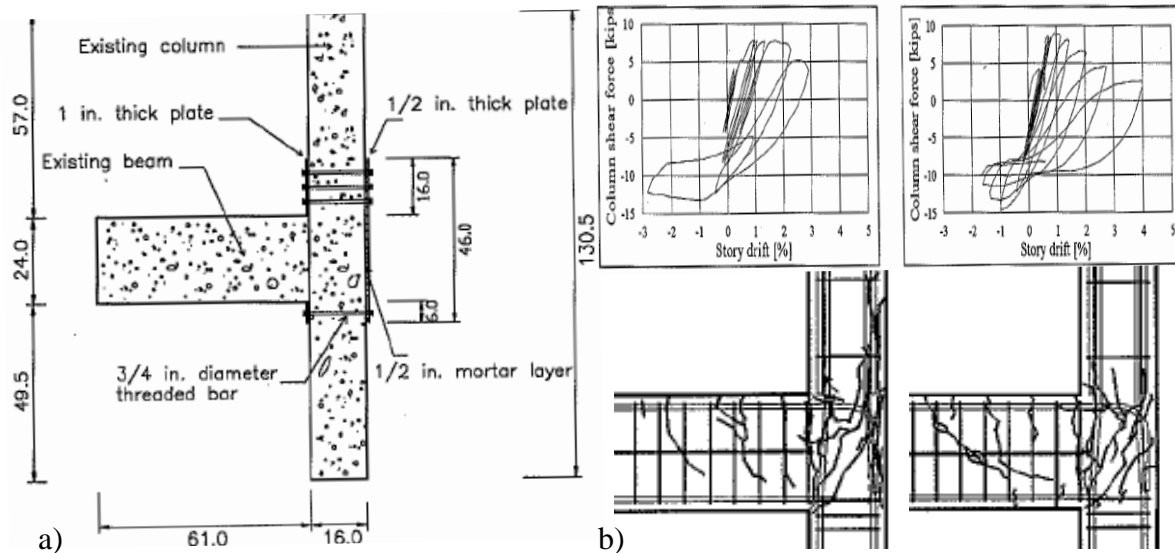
Confining steel plates retrofit as tested by Beres *et al.* [16]: a) retrofit details; b) force-displacement and damage pattern of as-built (left) and retrofitted (right) beam-column joint.
